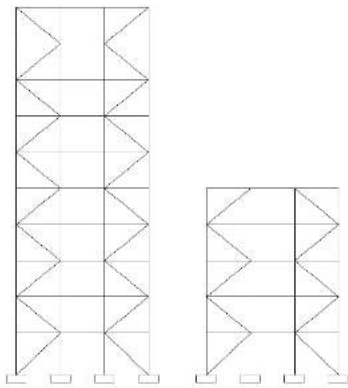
Frames System with Bracing Elements (Frame no 1)
